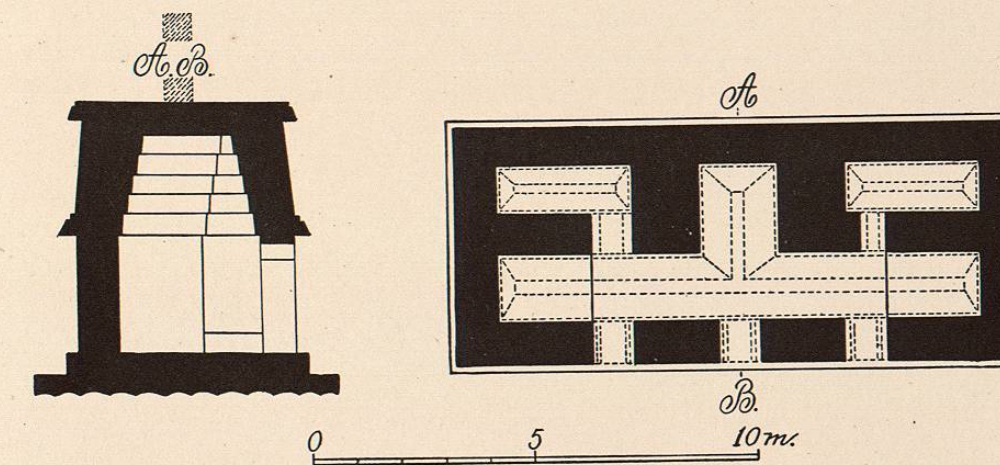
STRUCTURE 25: SECTION AND GROUND-PLAN (RESTORED).
